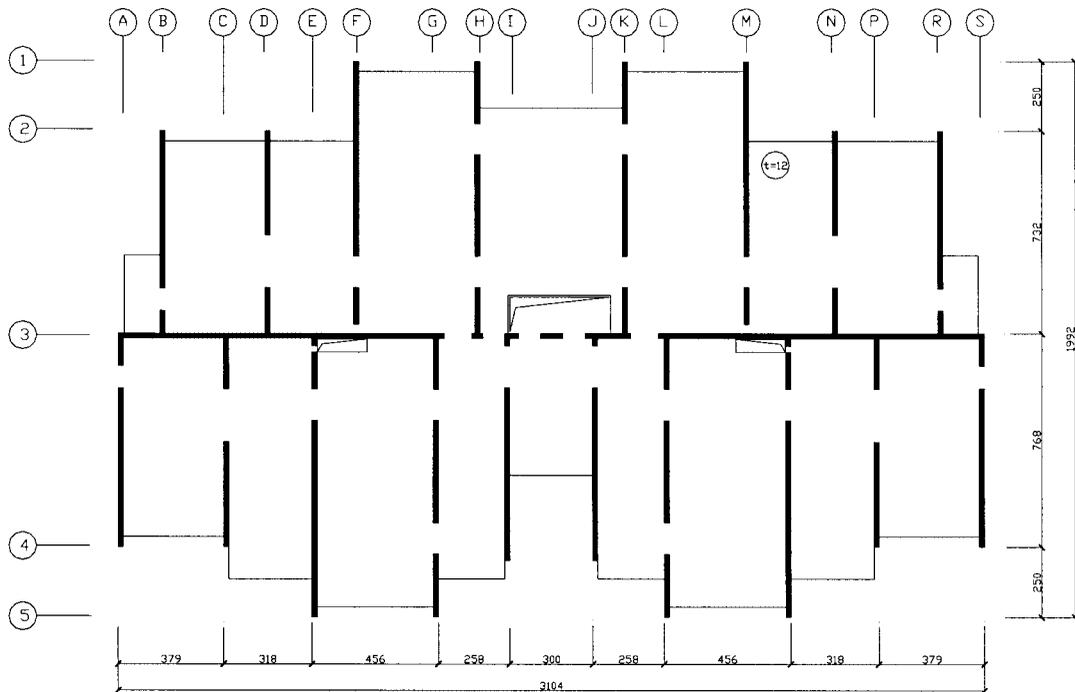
Typical plan view for a rectangular case (Plan No. 2).
